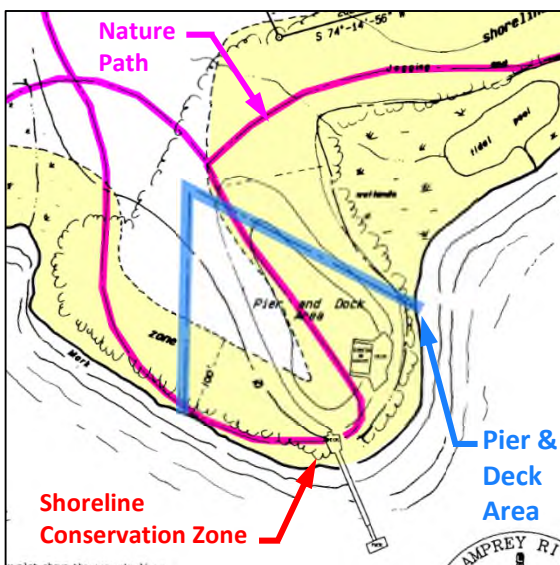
Excerpt, Moody Point Site Plan Screen House Deck & Pier, Plan No., A-1769, Sheet 2 of 3, Frederick E. Drew Associates, Jan, 1990.
